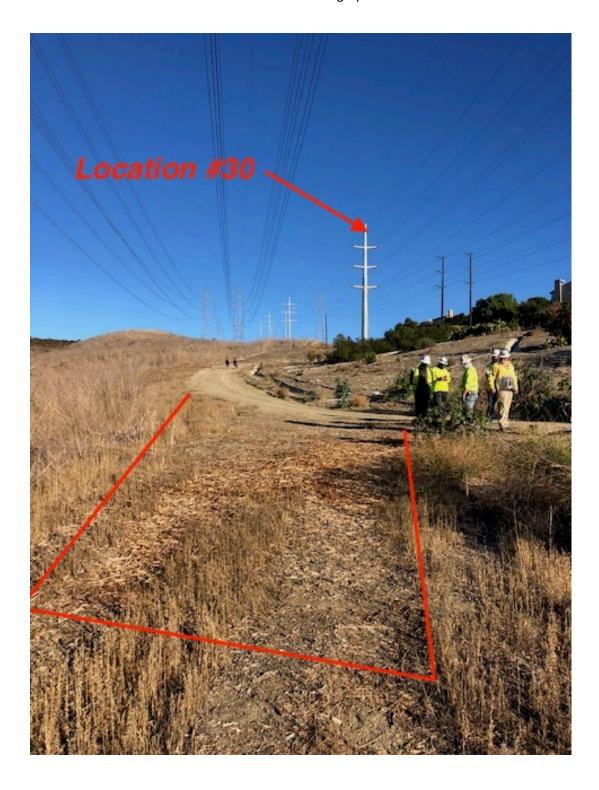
View of MPR-12 stringing site location adjacent to access road, facing N
